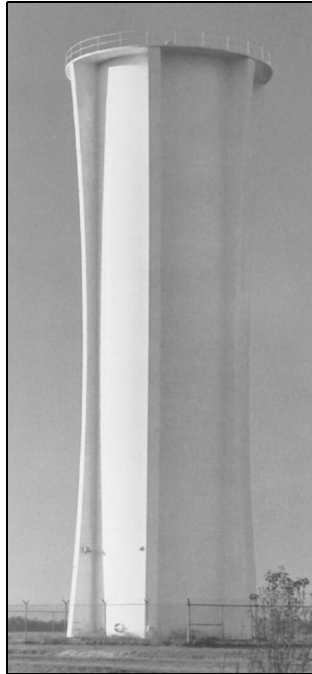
Welded steel standpipe with decorative pilasters
